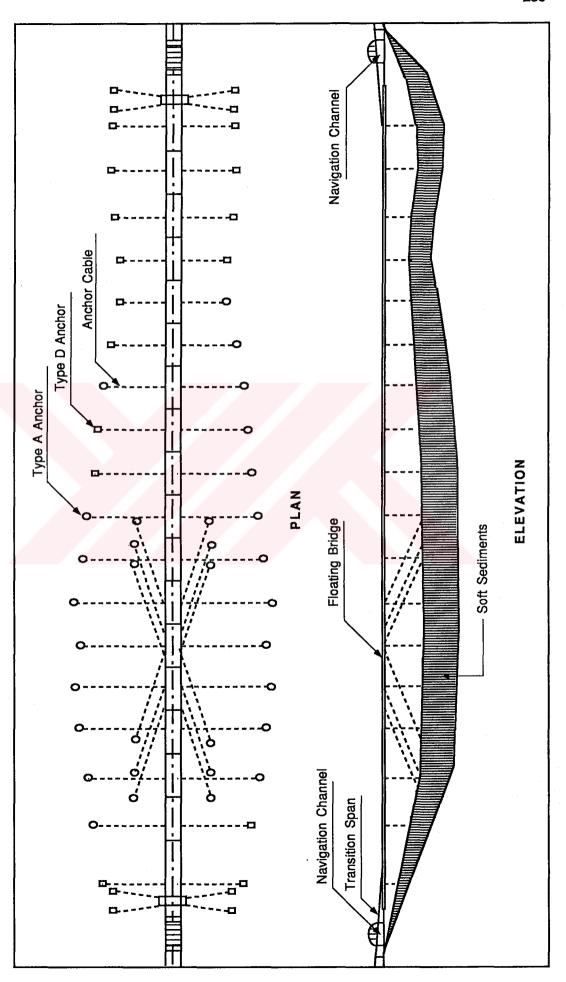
THE NEW LACEY V. MURROW FLOTING BRIDGE
